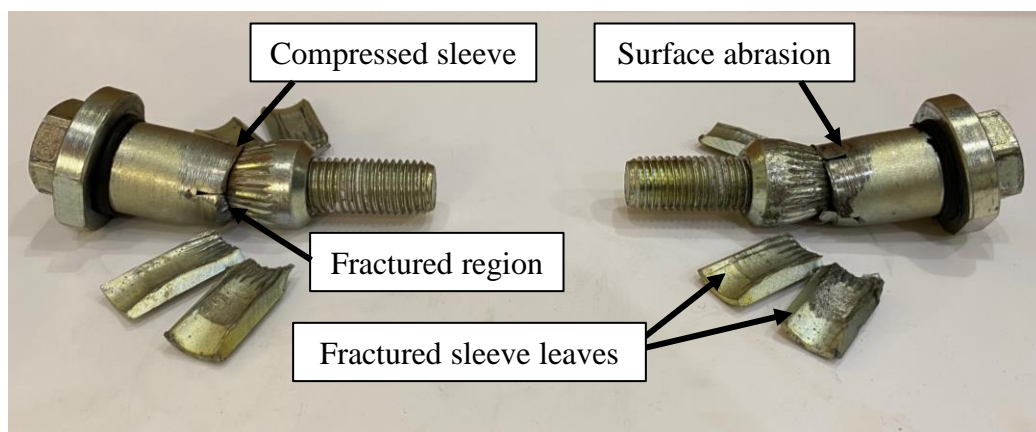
Hollo-bolts after testing for the specimen A-E65-C0-T6.3.
